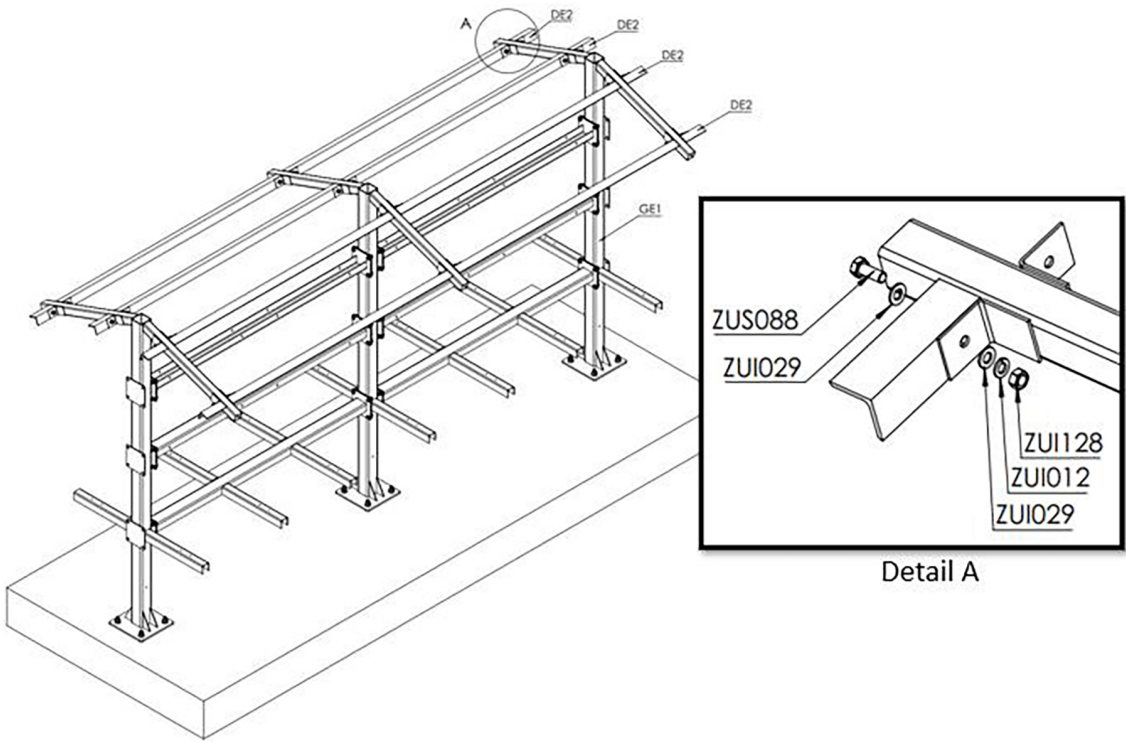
Assembly — Inverter rack — DE1-3, GE1 (detailed view)
